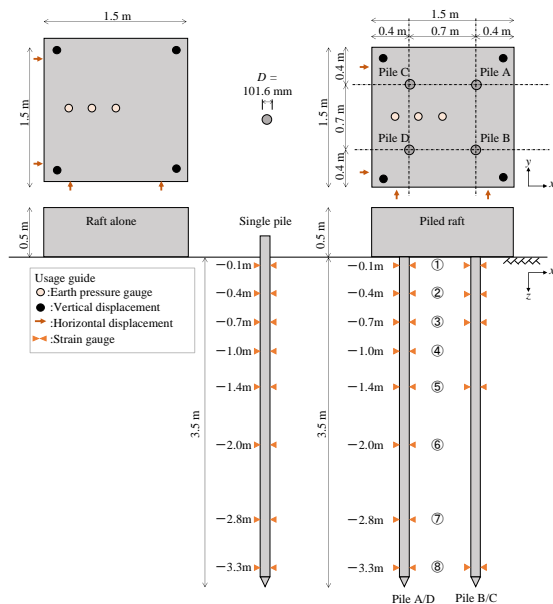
Shapes of foundation models and arrangement of measuring instruments.
